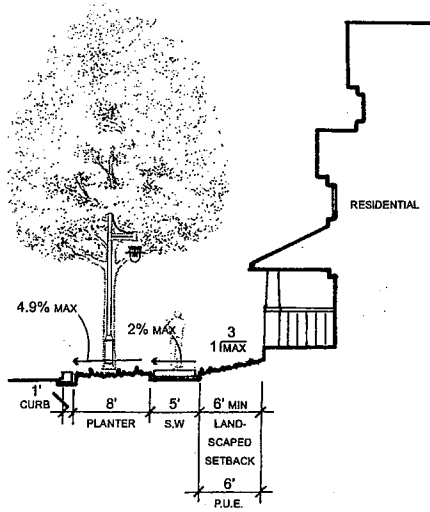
D.New.i: (Option A - Preferred) Harbor Way Partial Cross Section at Parking with Tree Lawn and Separated Sidewalk ①
